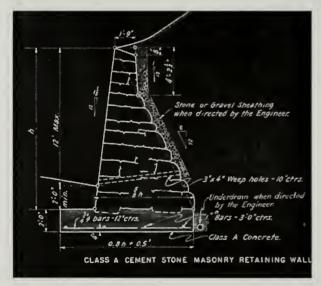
Detail of a mortared stone retaining wall from Day Mountain Road, 1939. (U.S. Department of Agriculture, Bureau of Public Roads, Project 9A1, Sheet 32 of x, June 1939)
